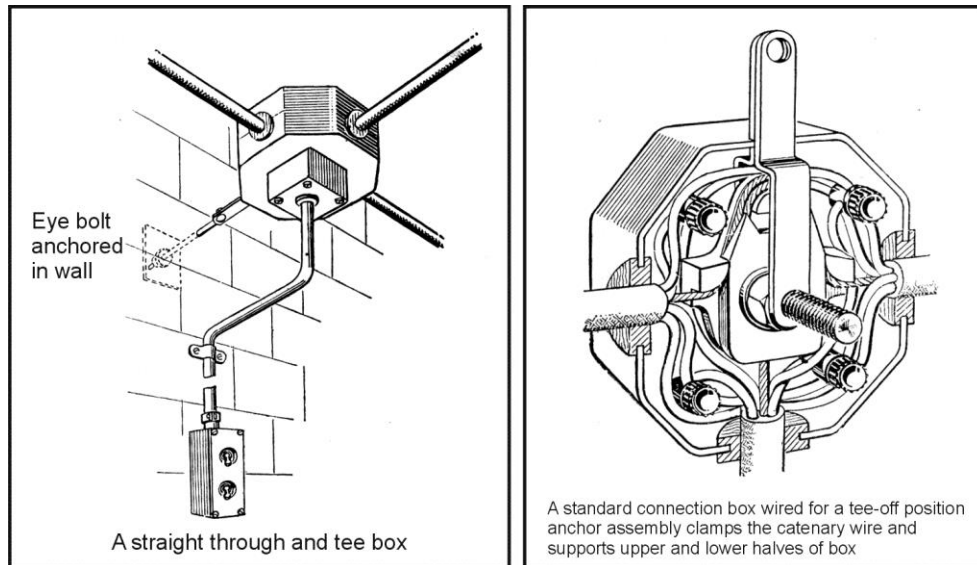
Conduit feed and Tee joint box and standard box wired for a Tee off position of Catenary system
